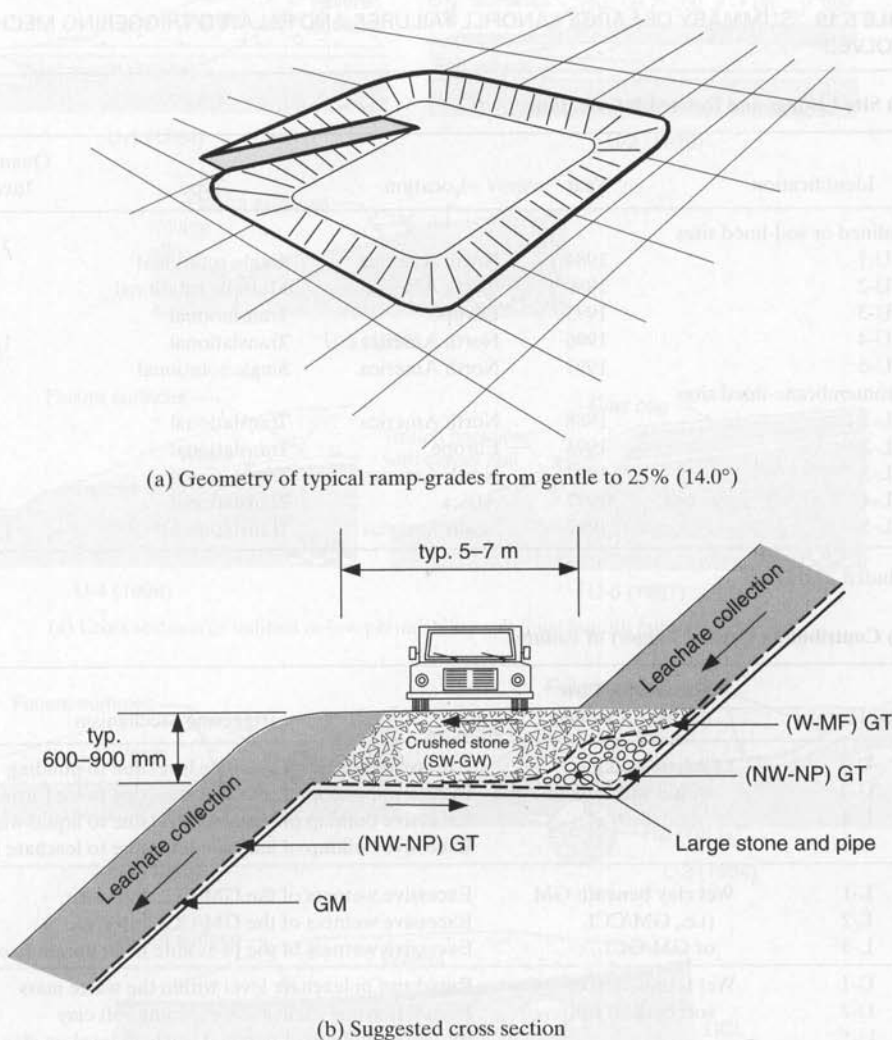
Typical geometry and cross section of a below-grade landfill access ramp.
